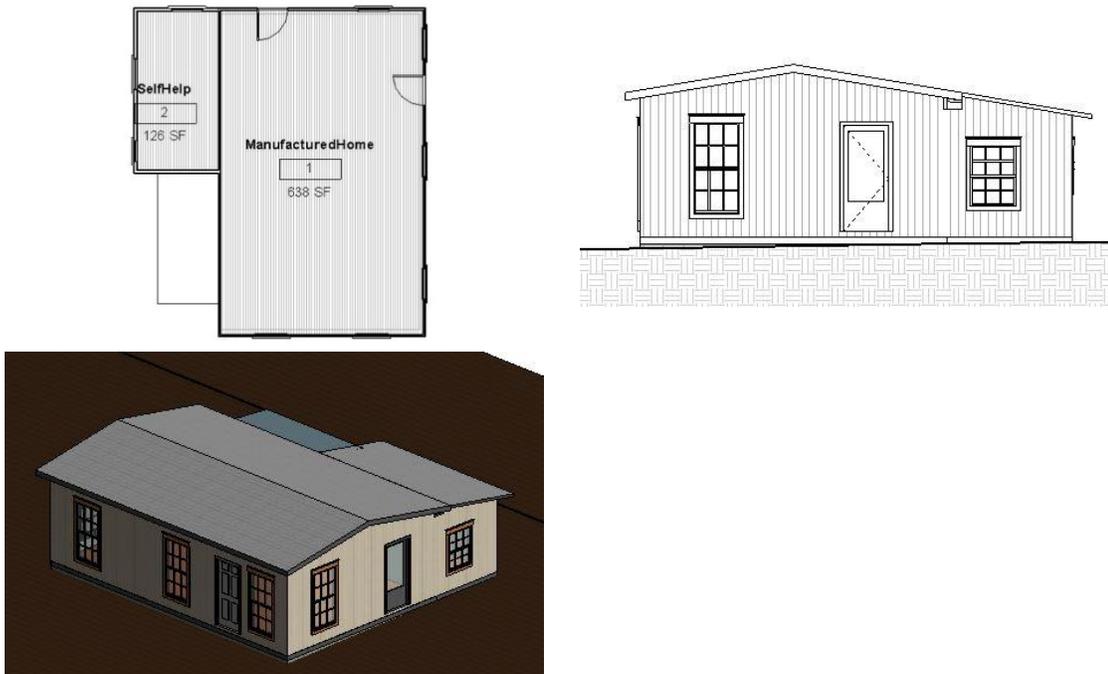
House 15 comprises a manufactured home with a pier and beam, wood frame, self-built addition: Plan, North elevation, and 3D BIM model.
